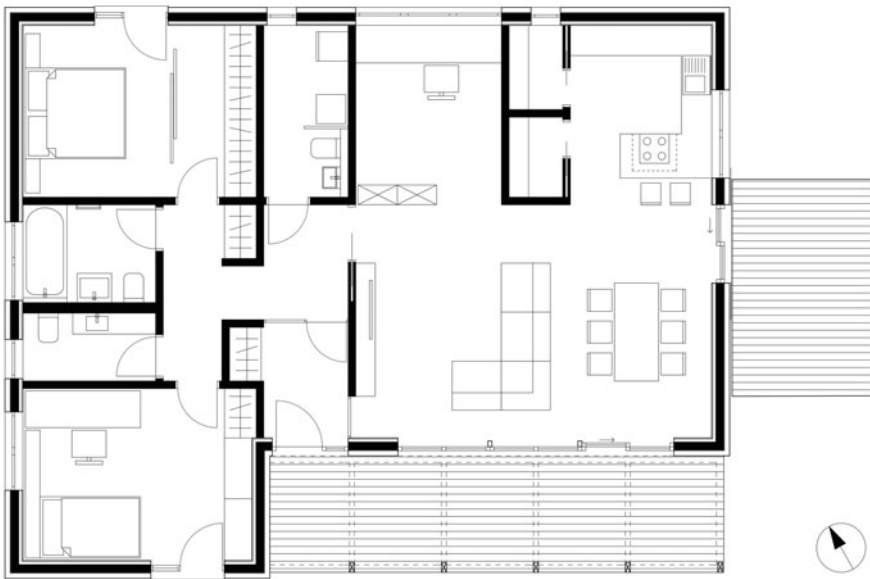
Energy-efficient timber-glass house Misaja with the ground-floor plan, designed by Vesna Zegarac Leskovar
